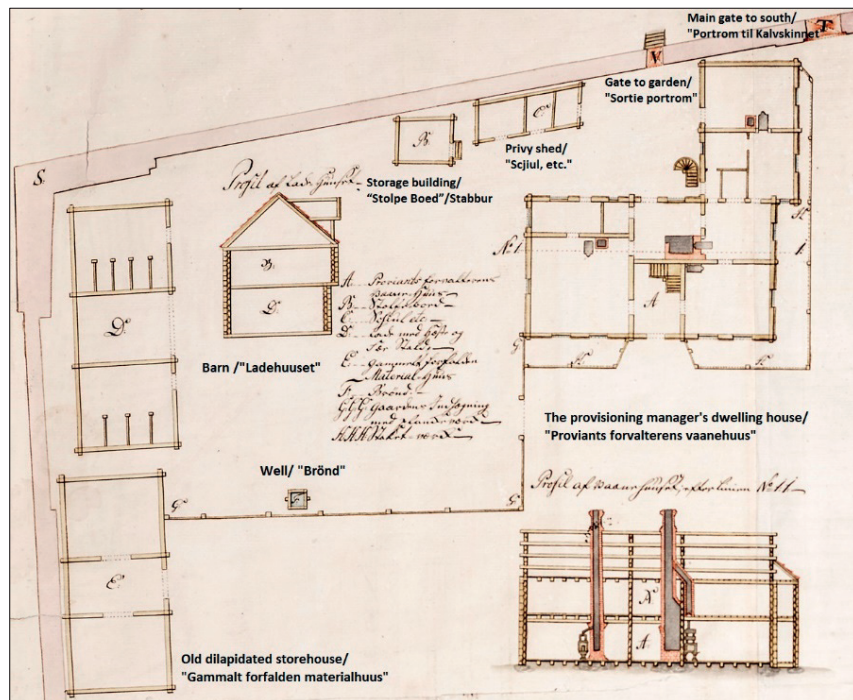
Detail of Eckleff's 1758 plan of Kongsgården with my annotations showing the buildings in the provisioning manager's fenced enclosure.¹²³⁰ The ground floors of the buildings as well as cross-sections of the dwelling house and barn are depicted. North to bottom.
